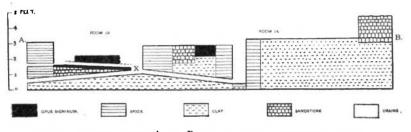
SECTION FROM A TO B ON PLAN OF BATHHOUSES, SHEWING DISPOSITION OF DRAINS IN ROOMS 19 & 14.
